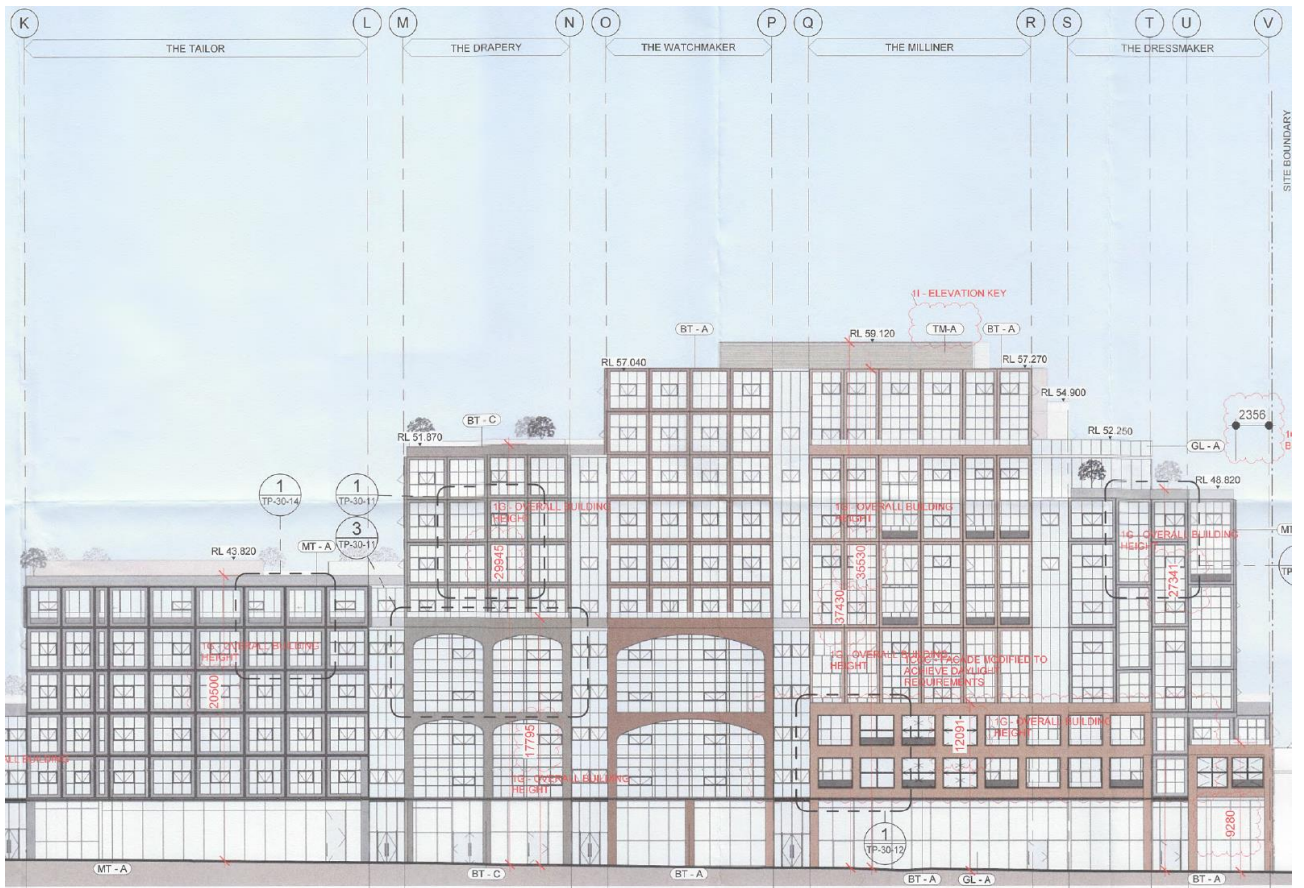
Approved Wellington St Elevation (Grid K to Grid V)
